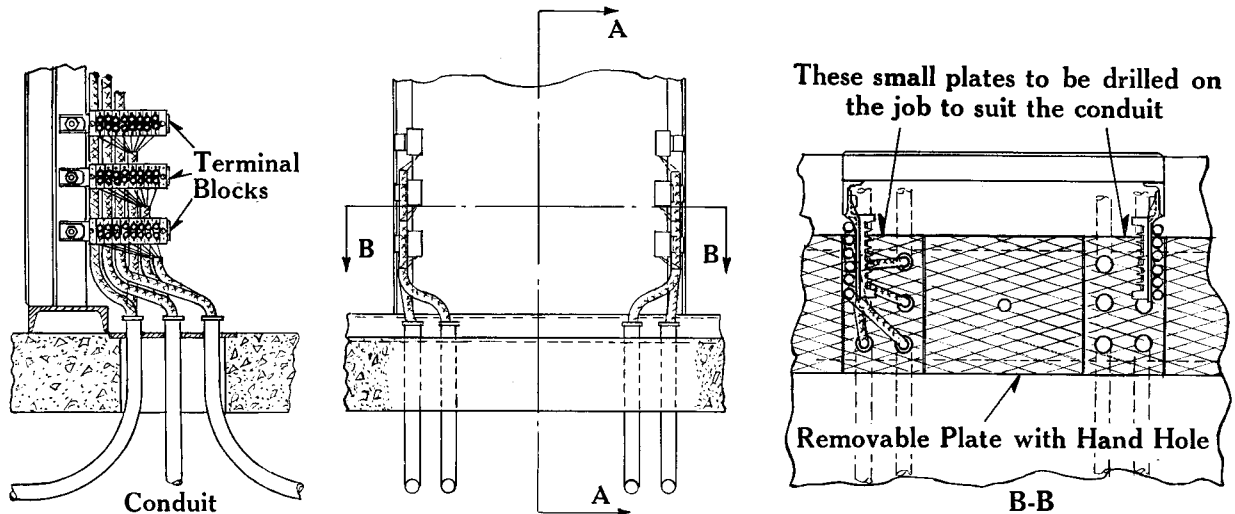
Terminating conduits at rear of switchboard panels. This arrangement shows the conduits extending through the floor and supported in place by stationary iron plates. (Angle iron frame Switchboard shown).
